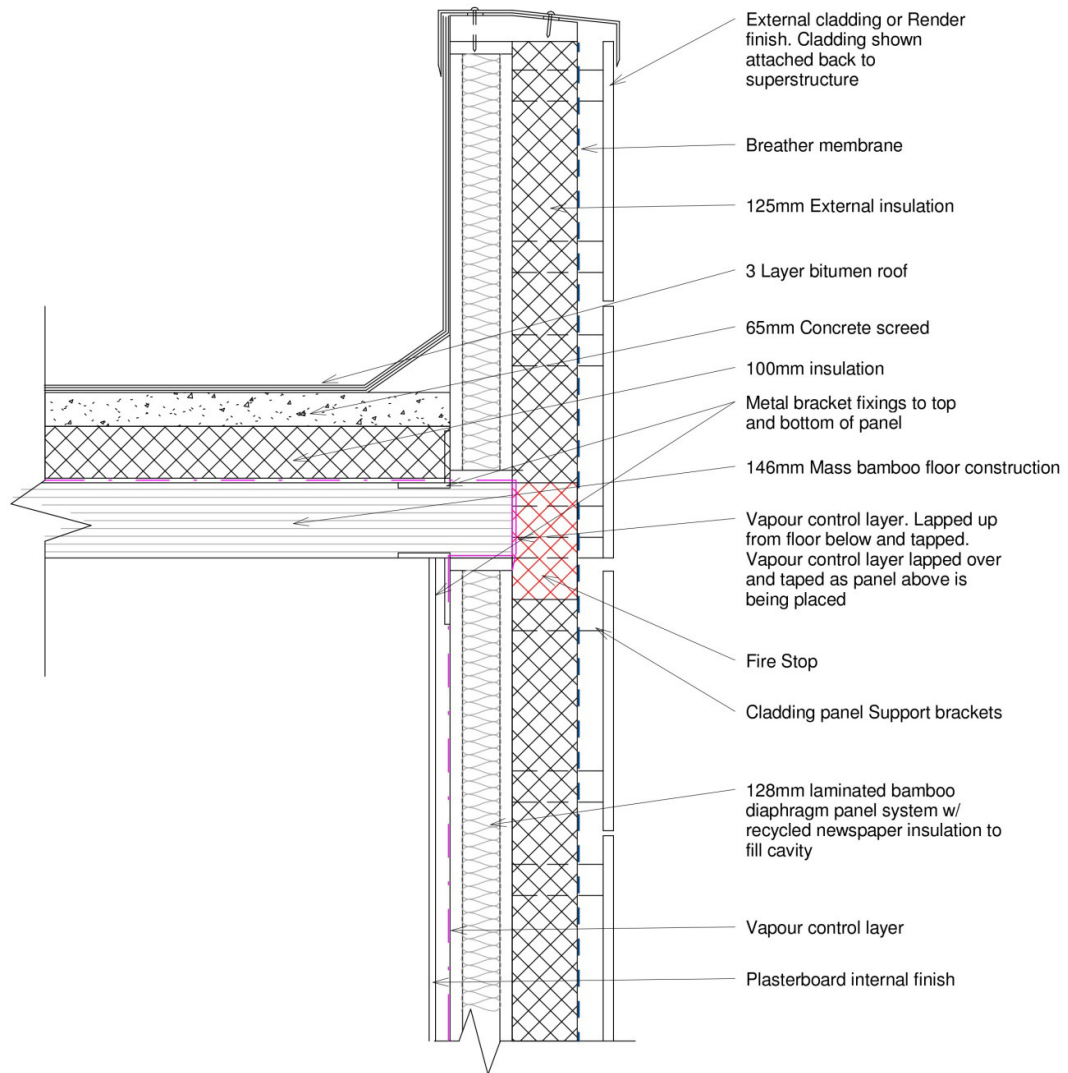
Construction Detail B (Not to Scale) (Parapet) for LVB Panel System
